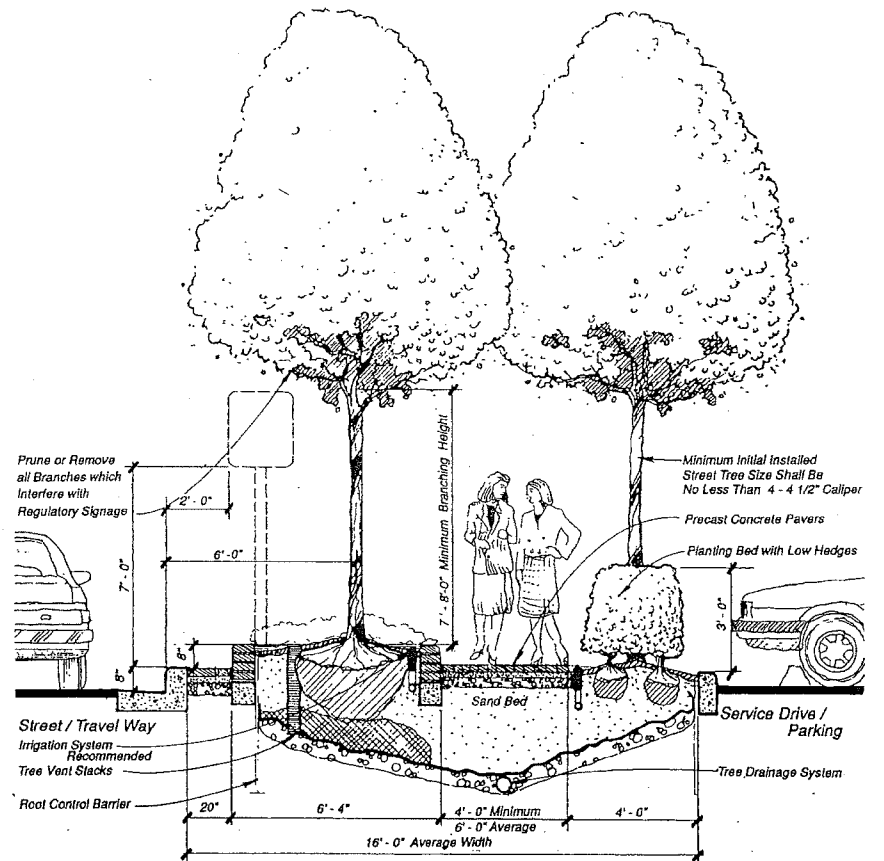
Typical Streetscape Module Section - Two Rows of Trees
